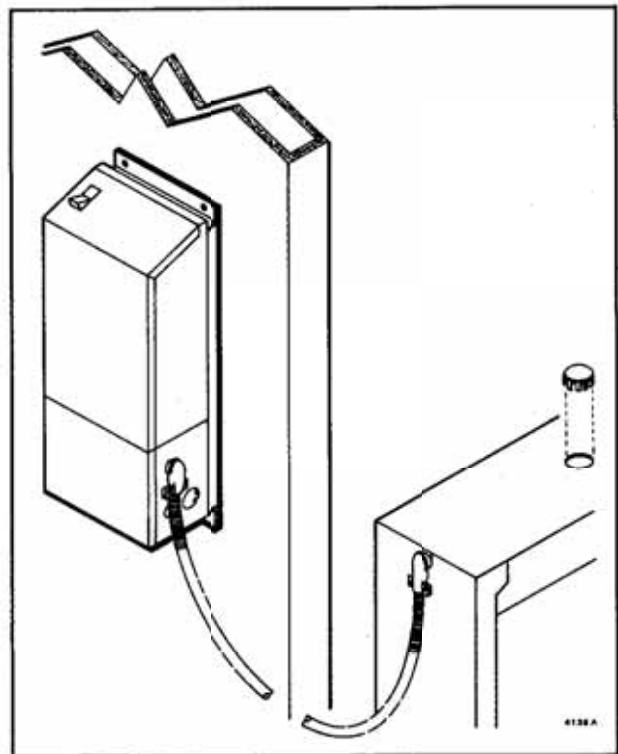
FLEXIBLE CONDUIT CONNECTS AIR CLEANER CABINET TO REMOTE POWER SUPPLY.
